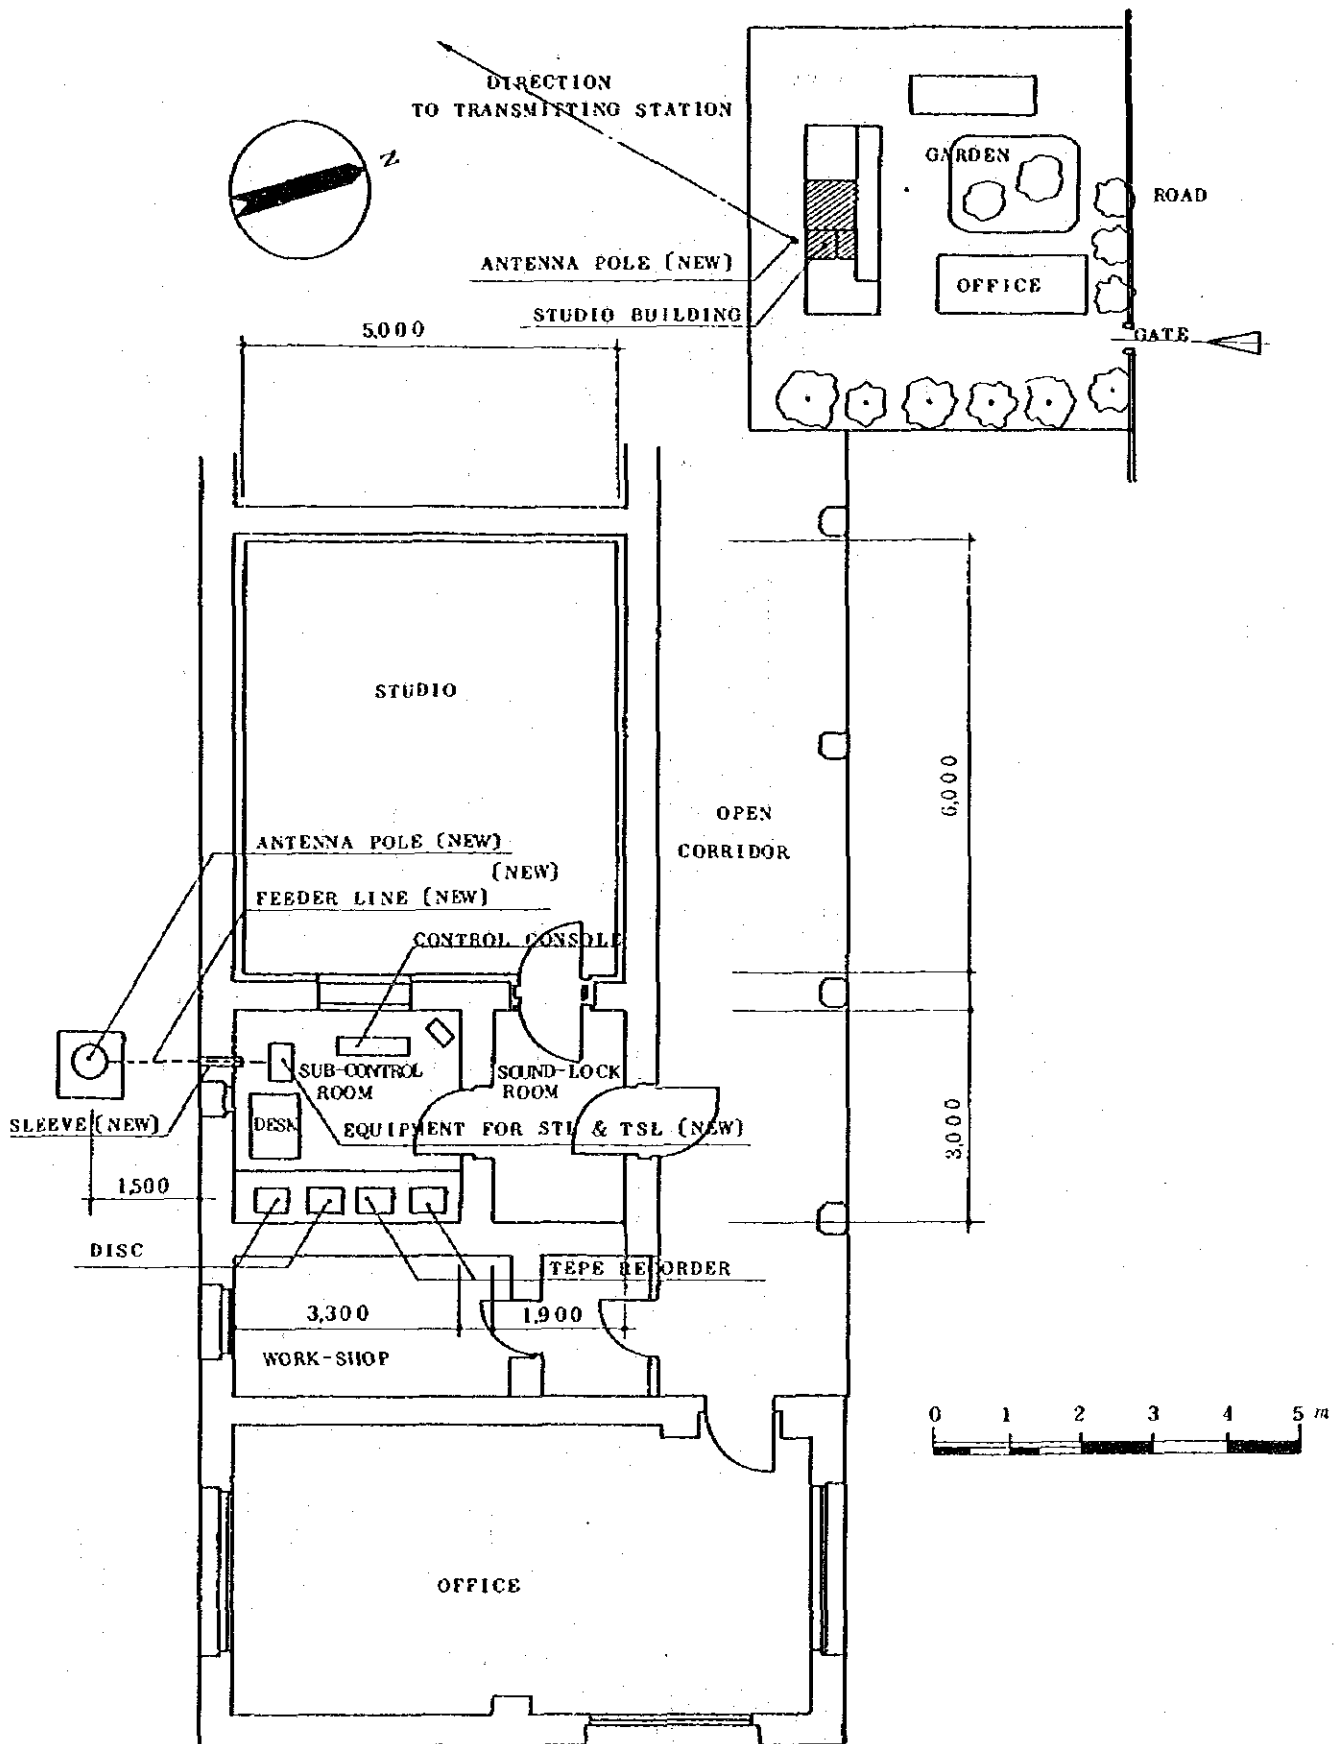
Layout of Equipment and Other Facilities (Kassala)
